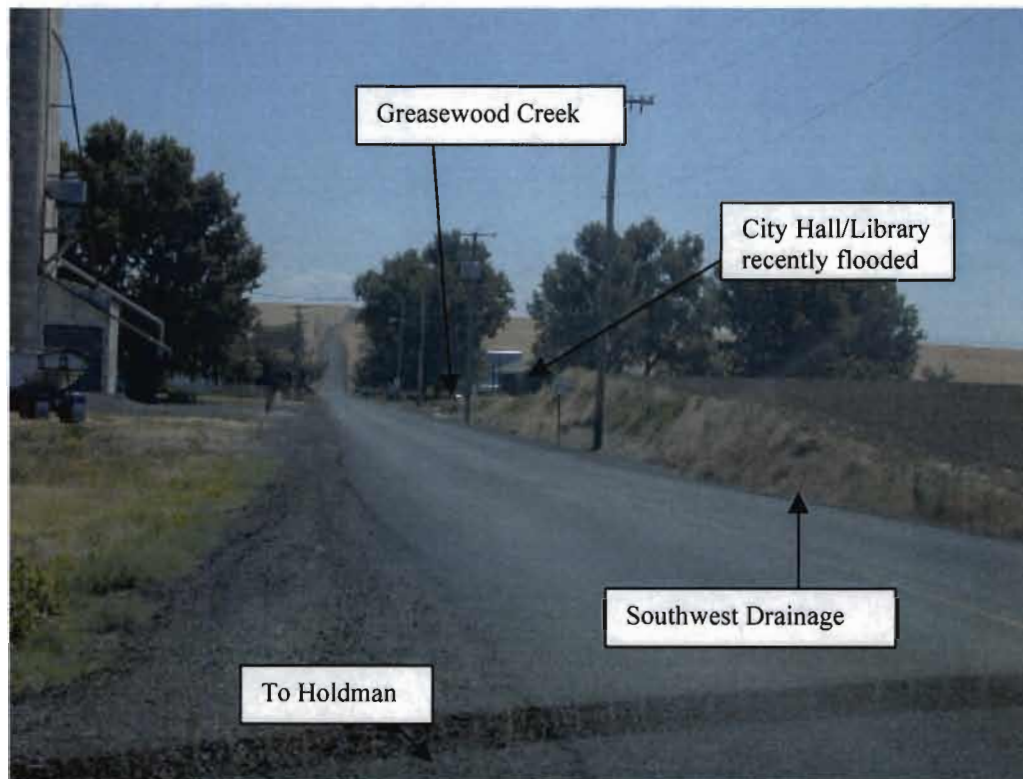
View looks southeast at Southwest Drainage and Greasewood Creek on west edge of town.
